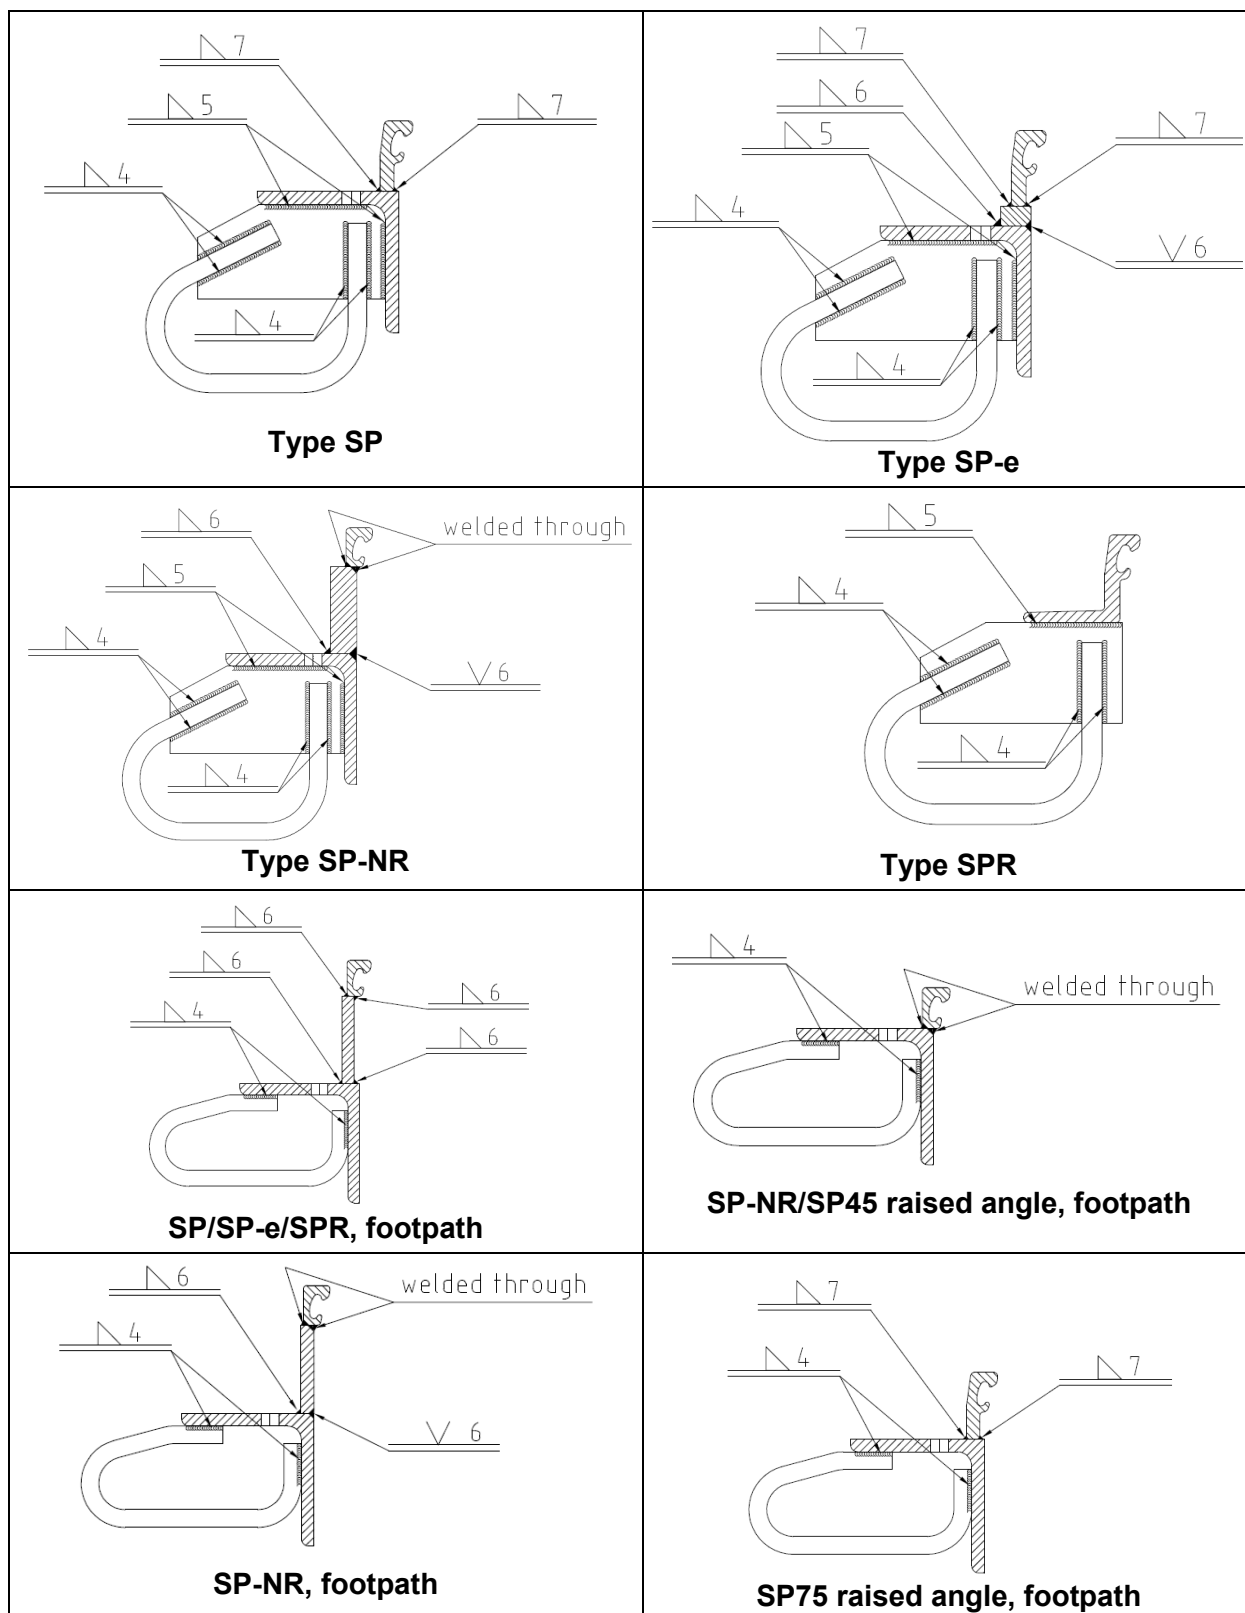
Dimension and type of welds according to EN ISO 2553
